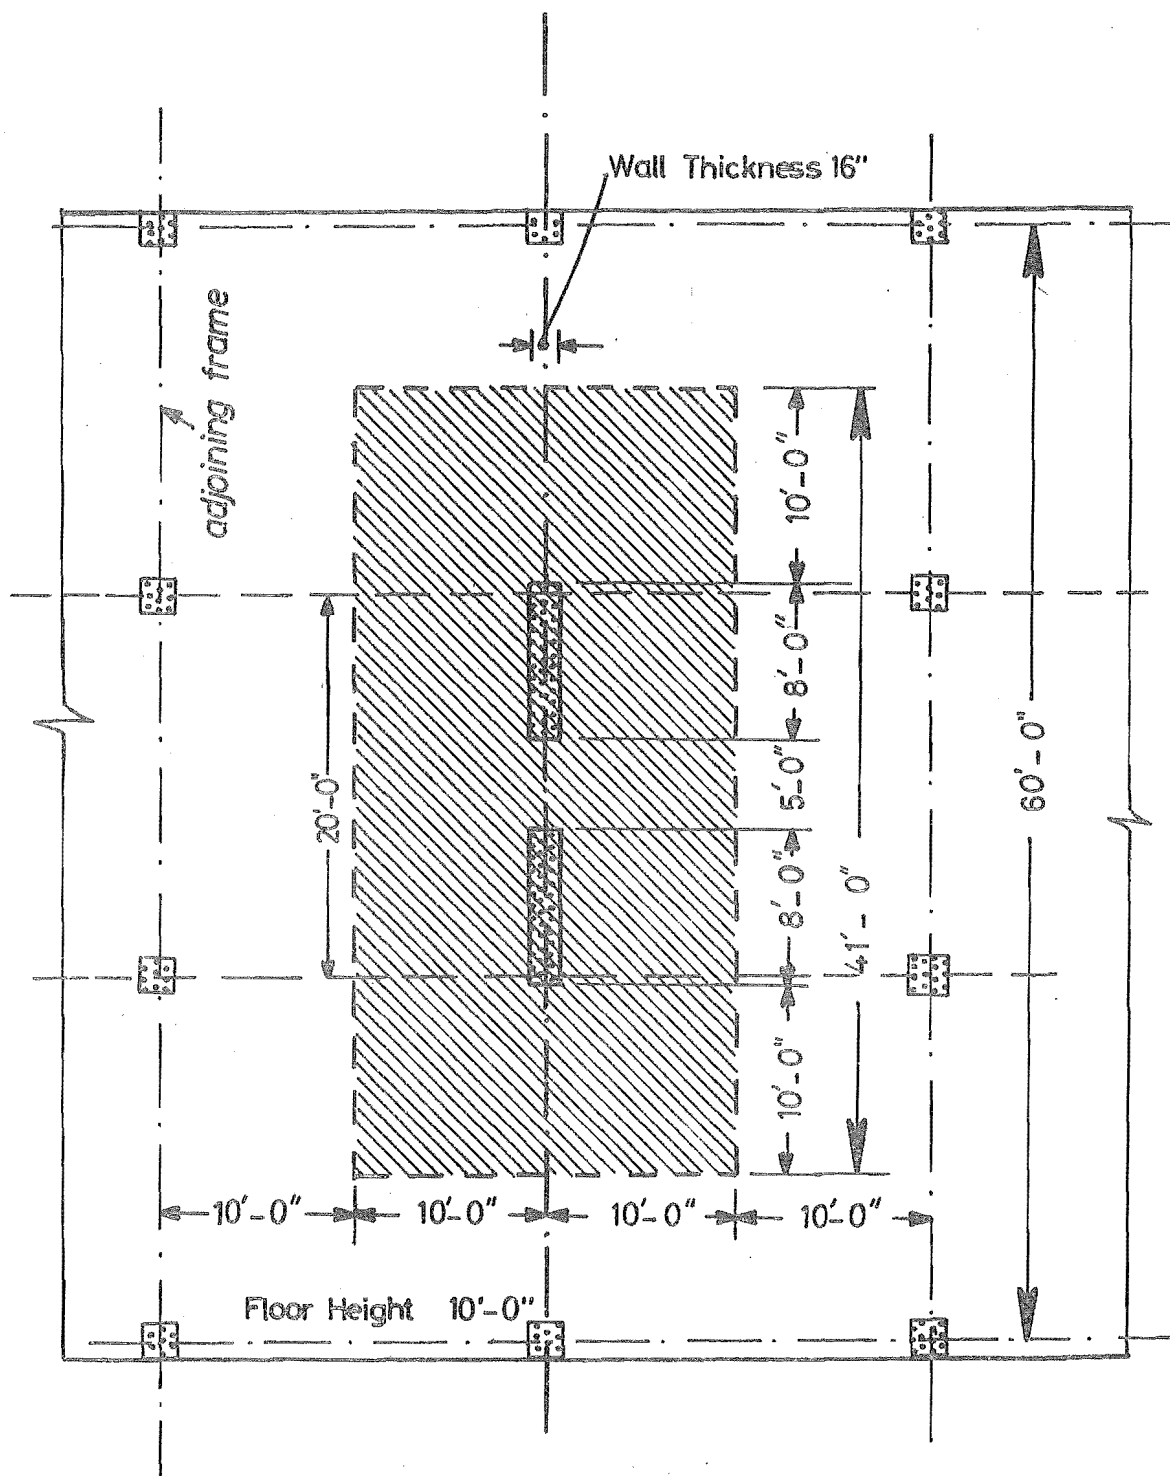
A TYPICAL BAY OF A SHEAR WALL STRUCTURE
